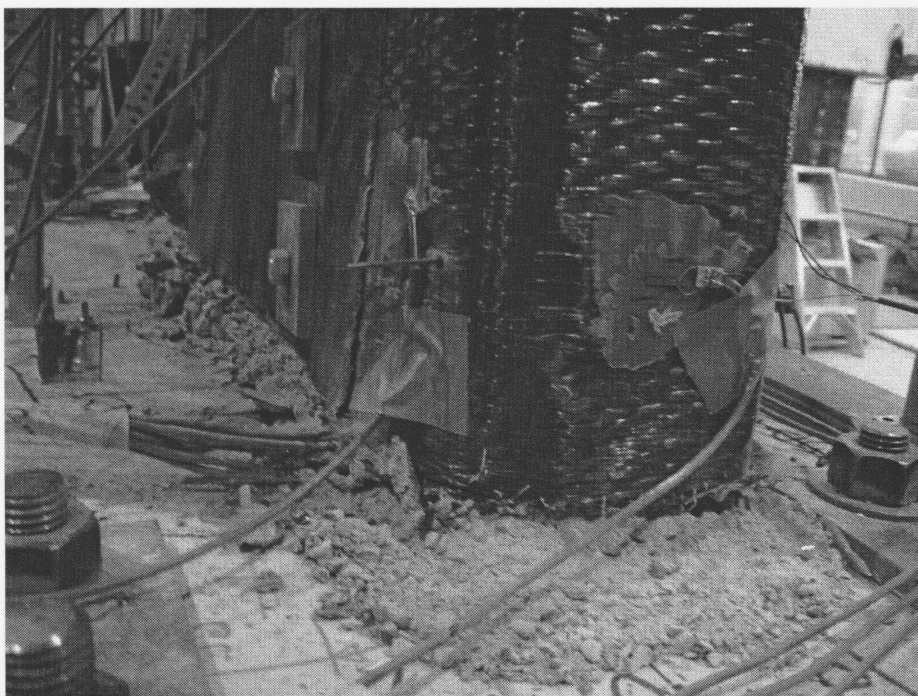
57 Concrete crushing at the bottom of wall RW7.
